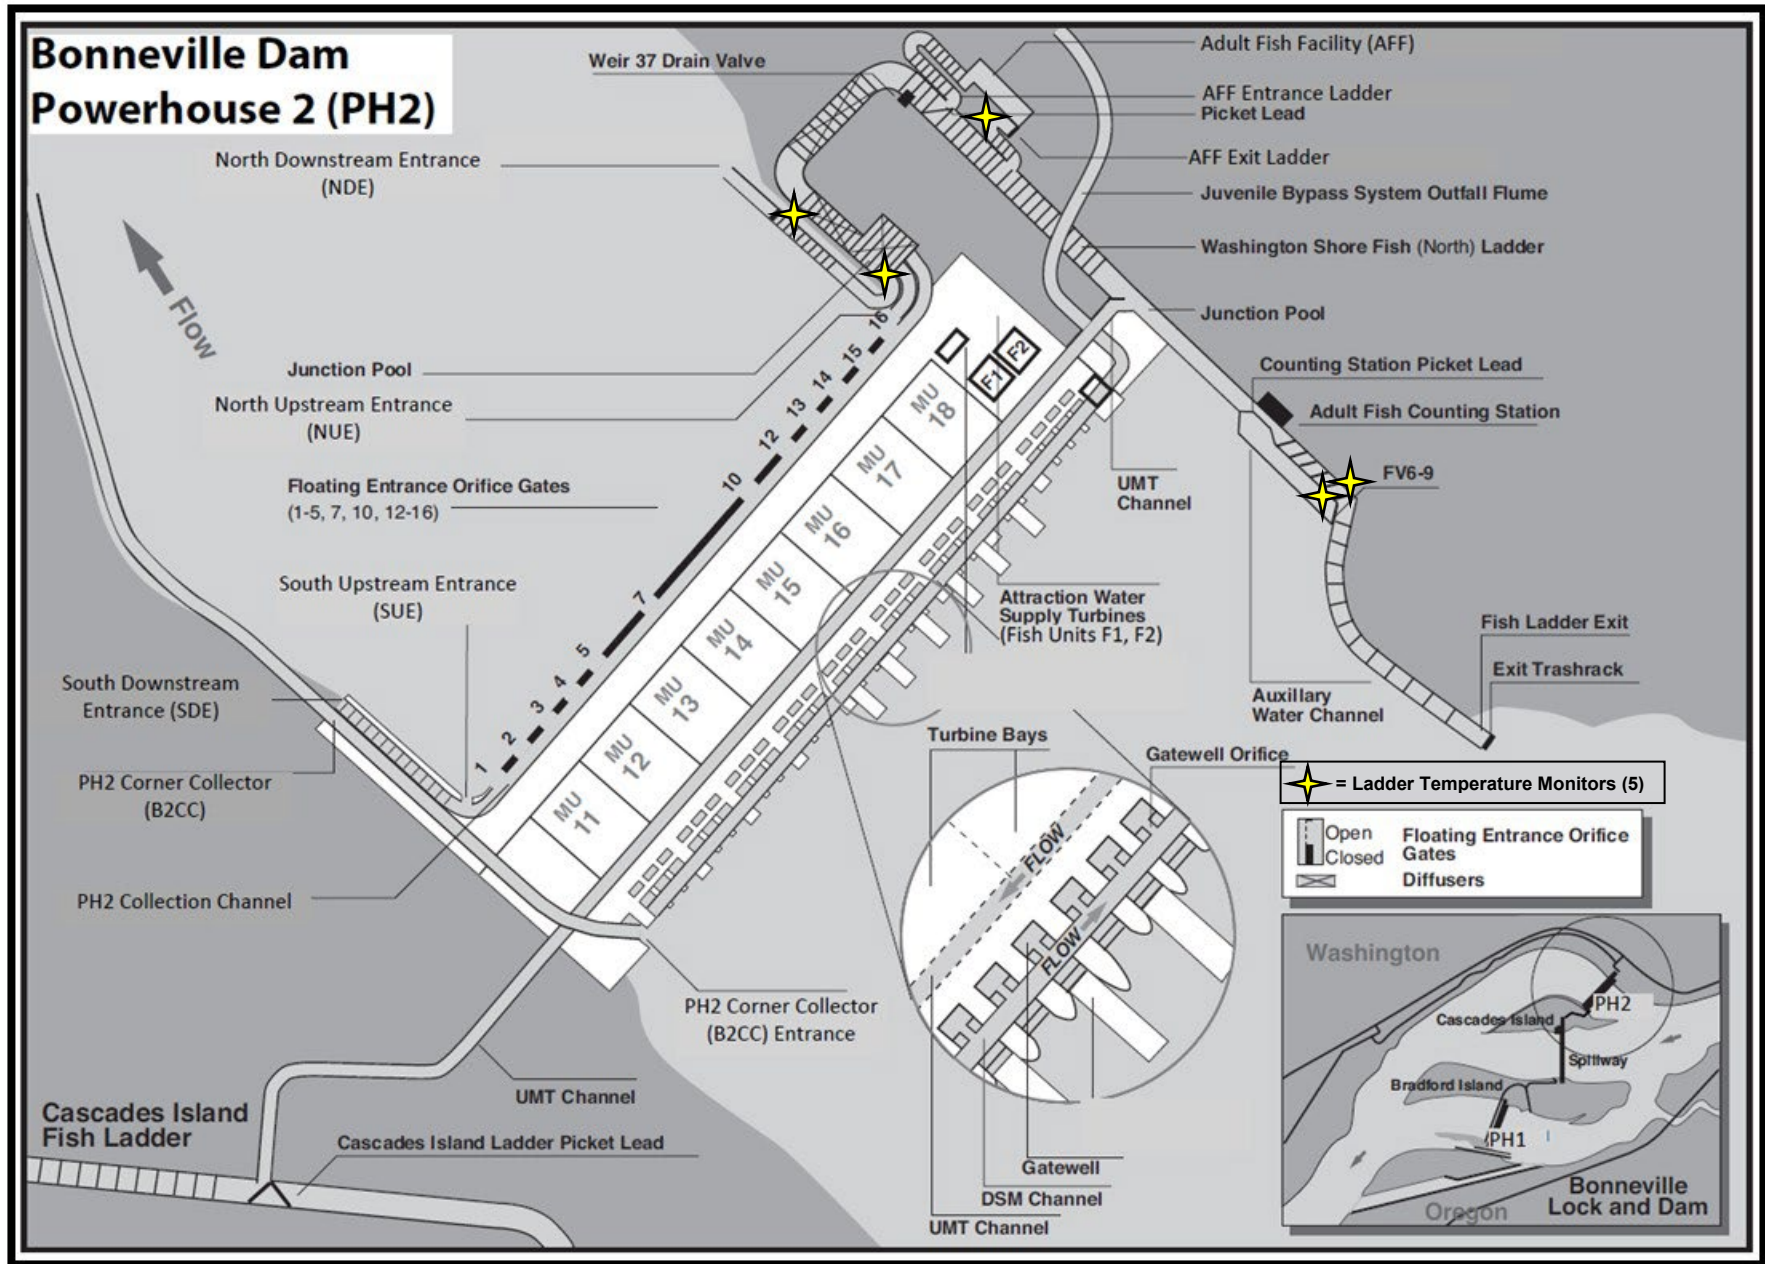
Bonneville Dam Powerhouse 2 (PH2) and Washington Shore (WS) North Fish Ladder.
